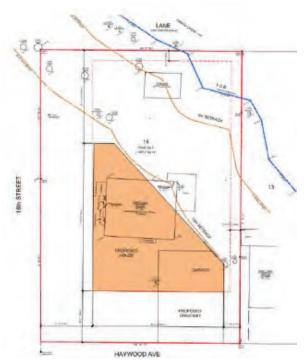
Building Envelope for Zoning Compliant House on the Existing Lot
